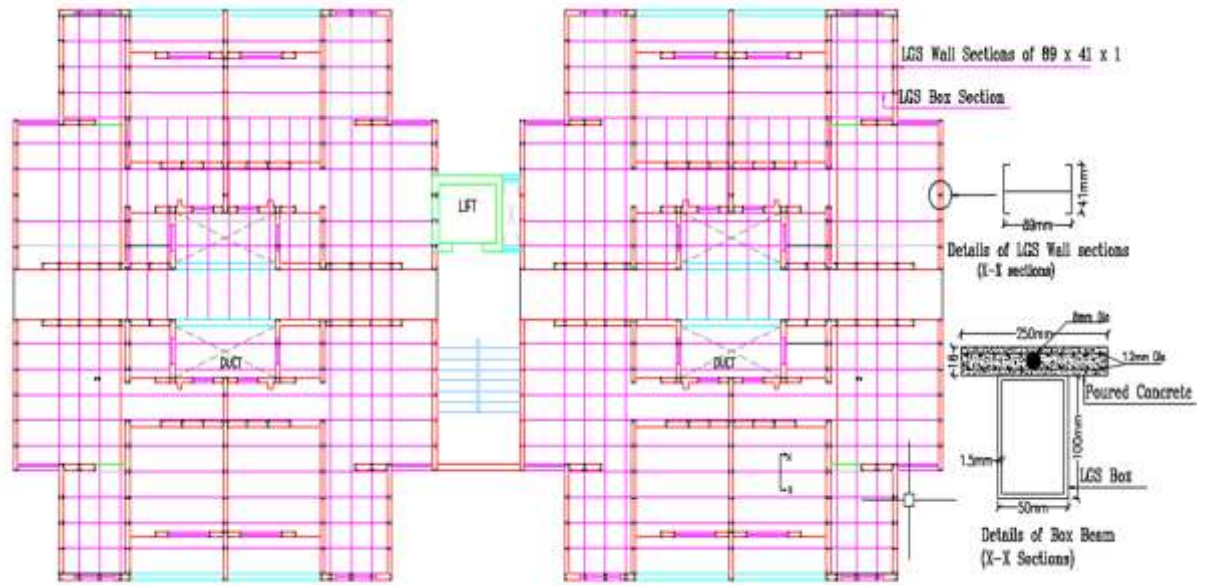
LGS beam and column locations for Ferrocement- LGS construction
